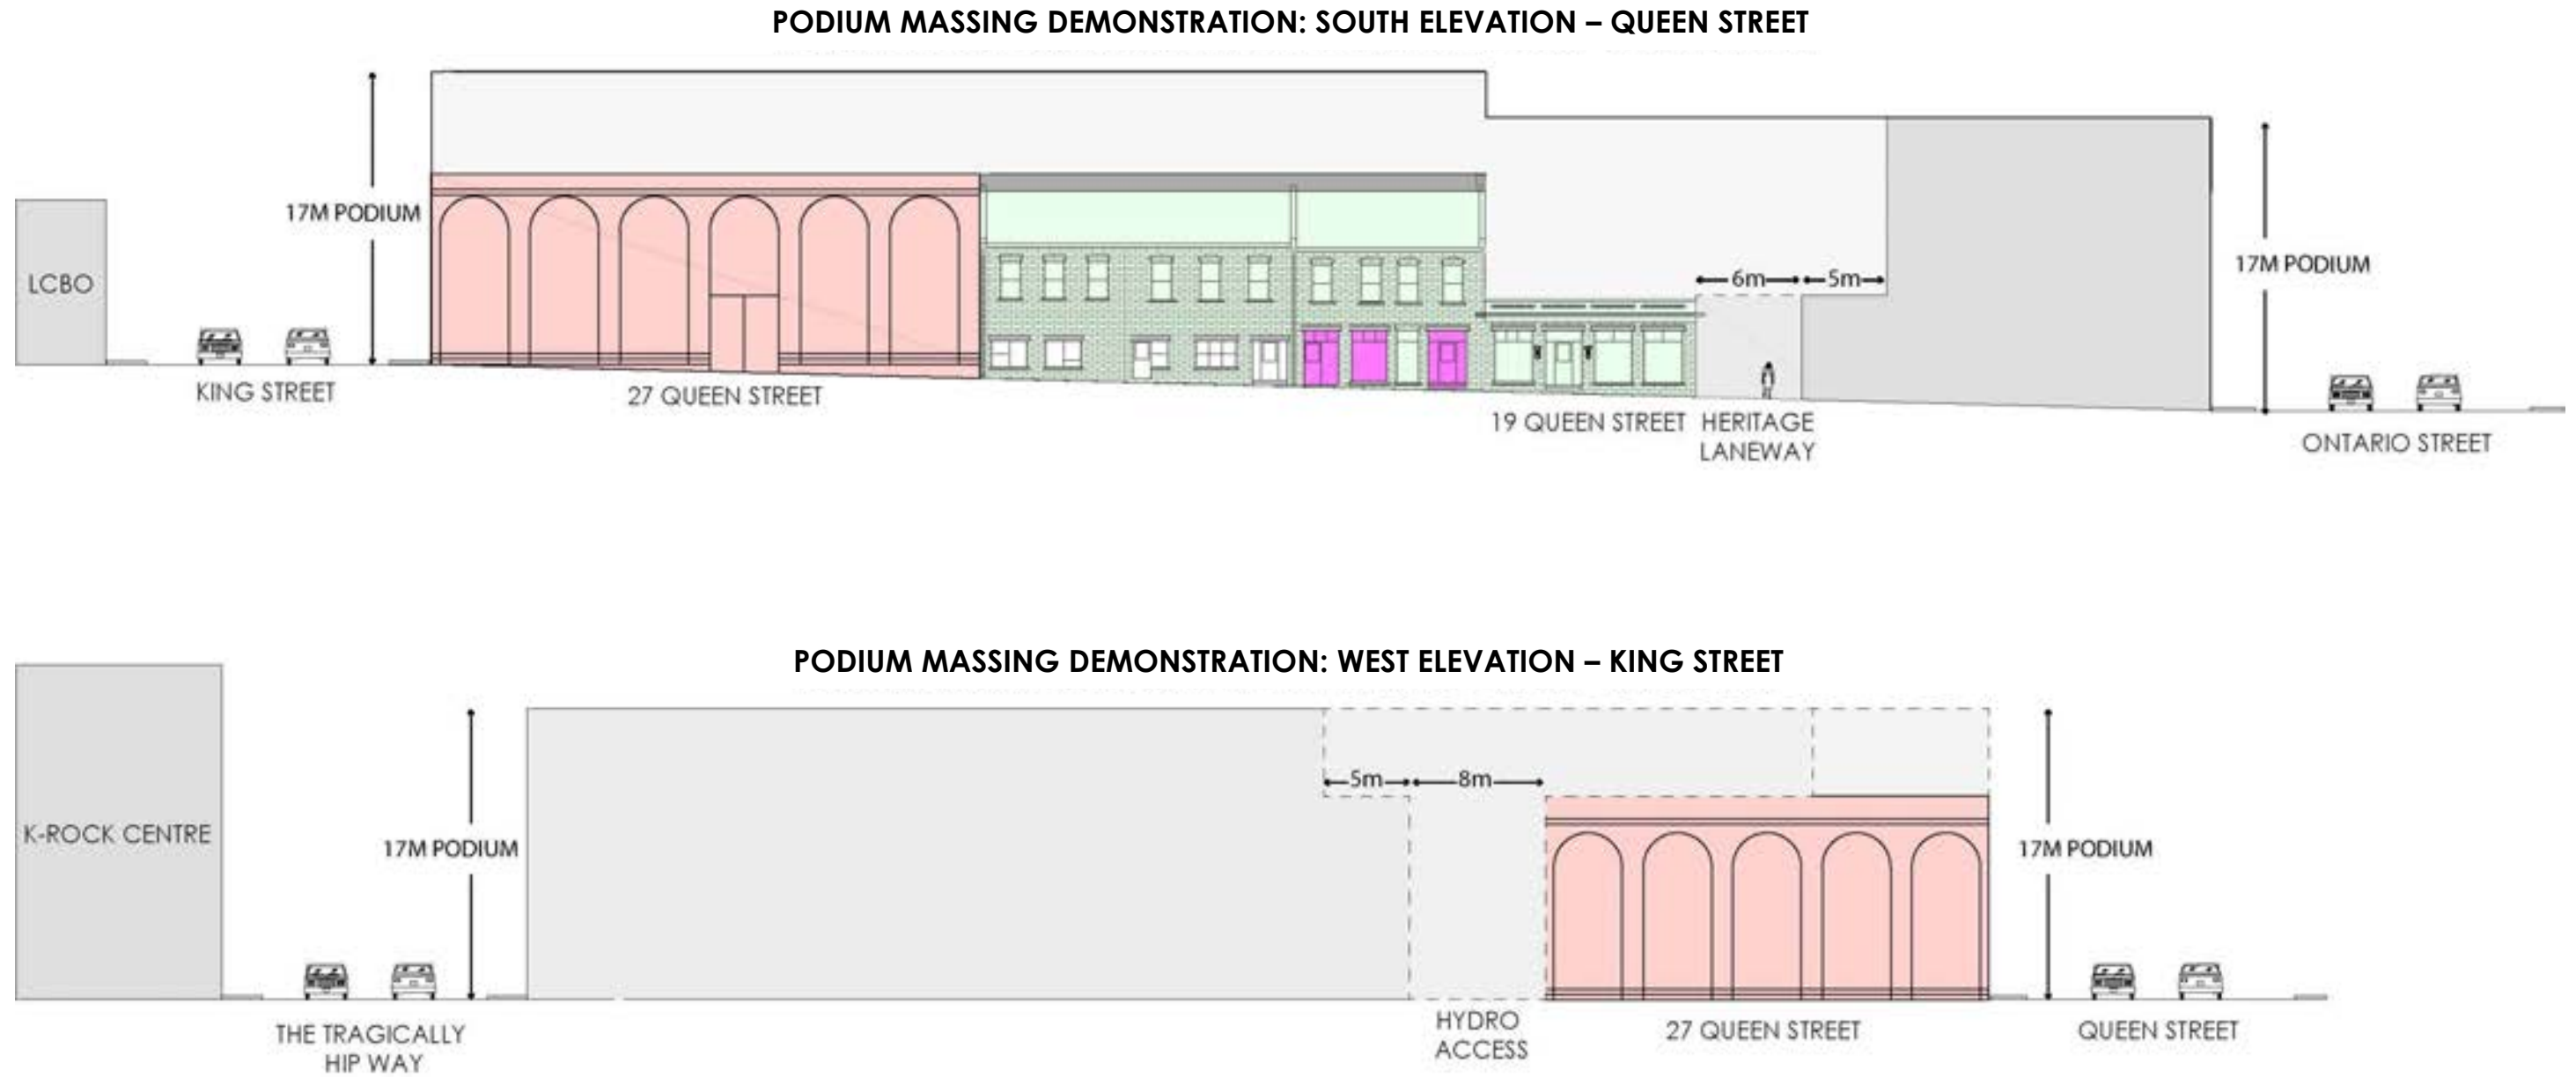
Podium elevation views showing required setbacks for new infill development adjacent to the existing heritage buildings on site.
